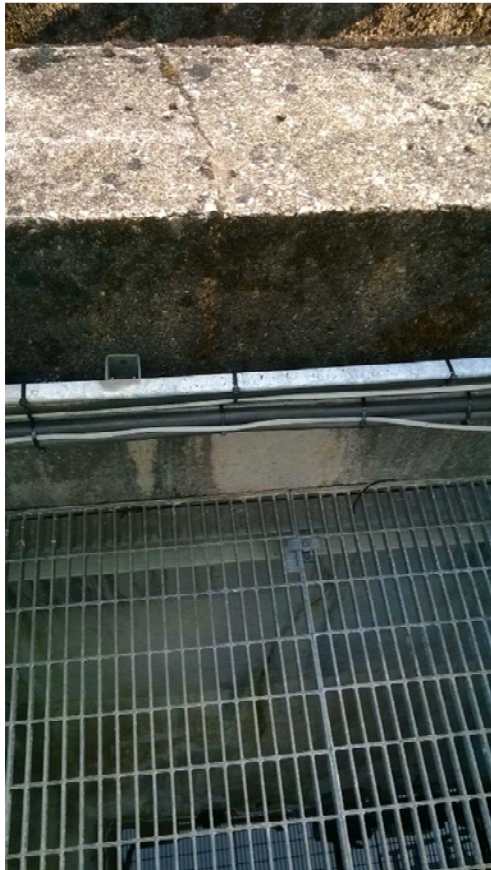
Caustic Tank – Crack through wall (2)
